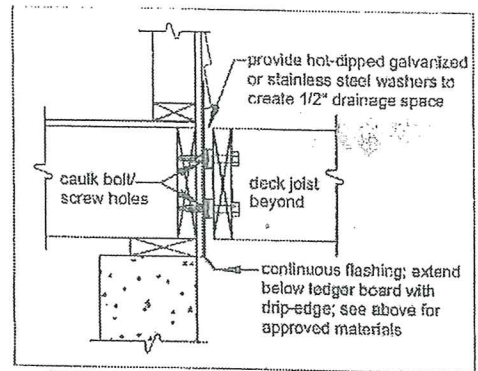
TYPICAL FLASHING DETAIL WITH DRAINAGE SPACE
